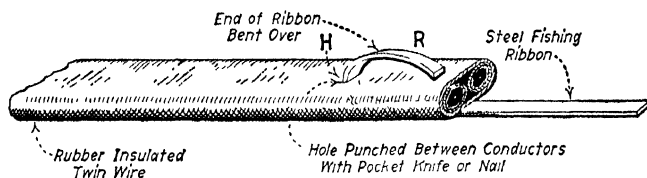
Showing how steel fishing ribbon may be hooked through twin wire for drawing in.
